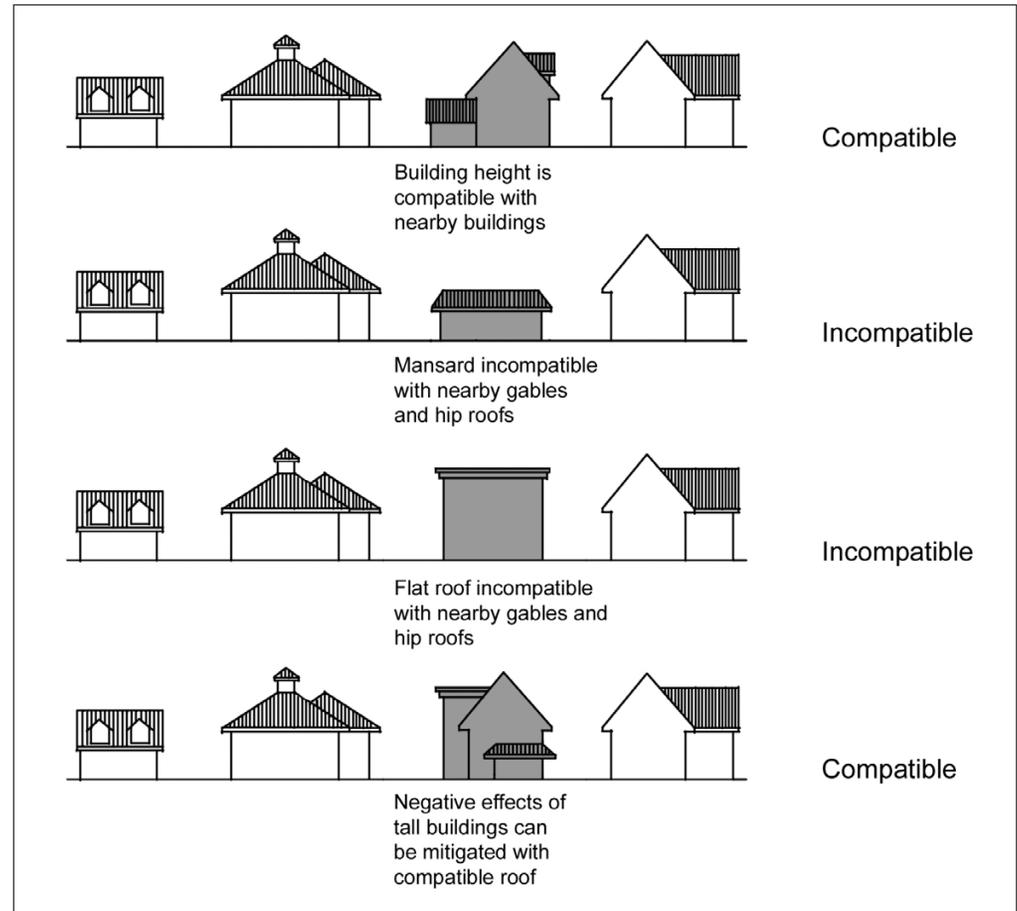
Building heights and roof profiles should be similar and balanced in height and scale.
